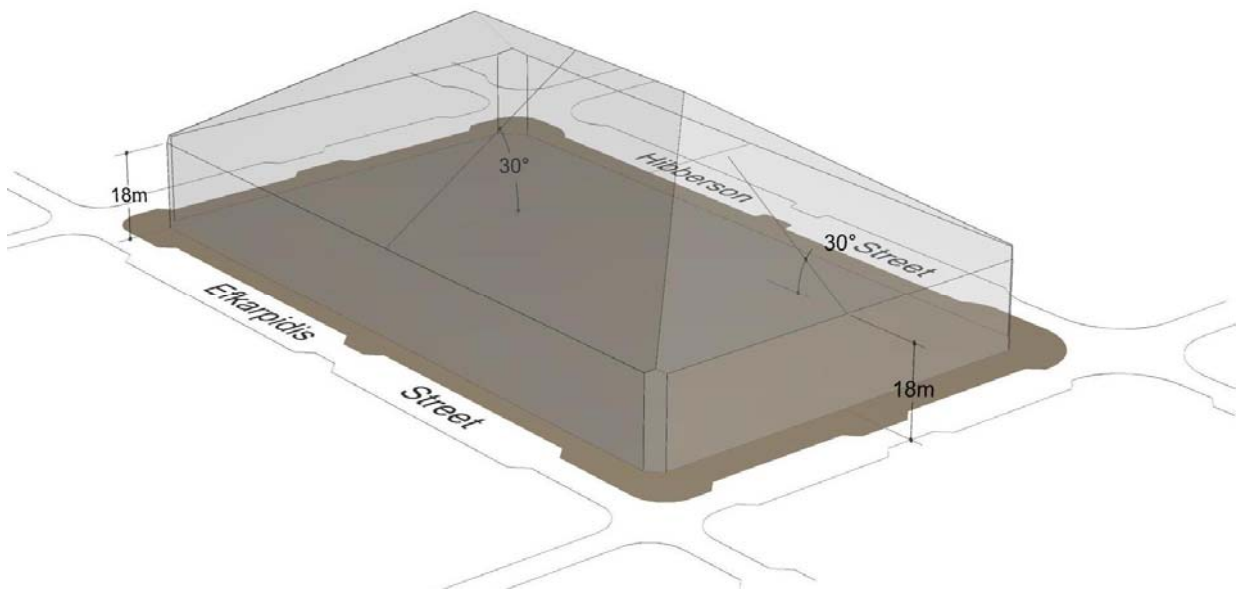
Building envelope in Precinct 1a (north side of Hibberson Street)
